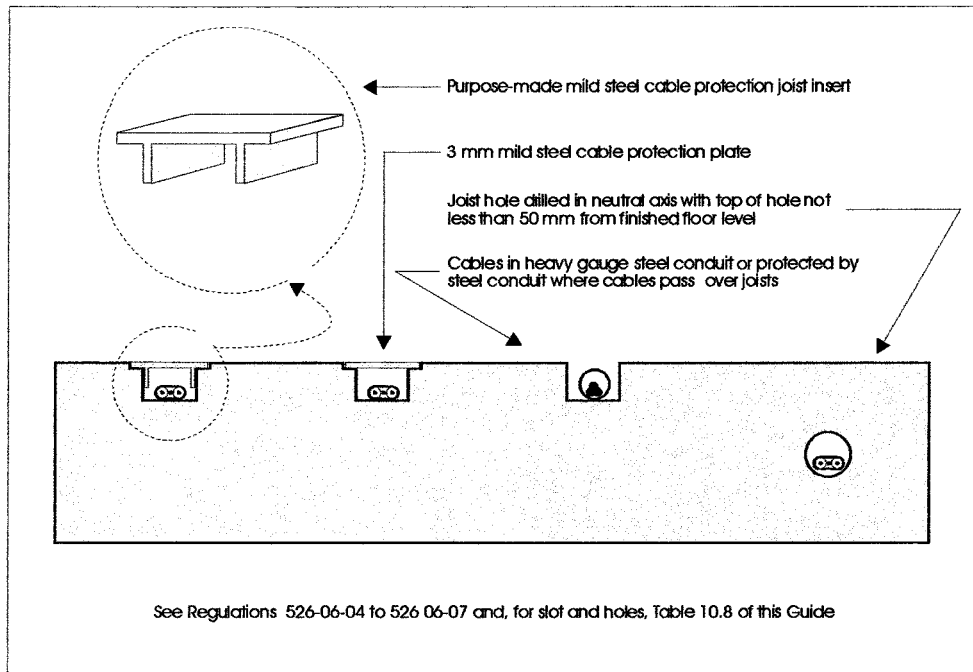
Cables through timber joists – four methods of mechanical protection
